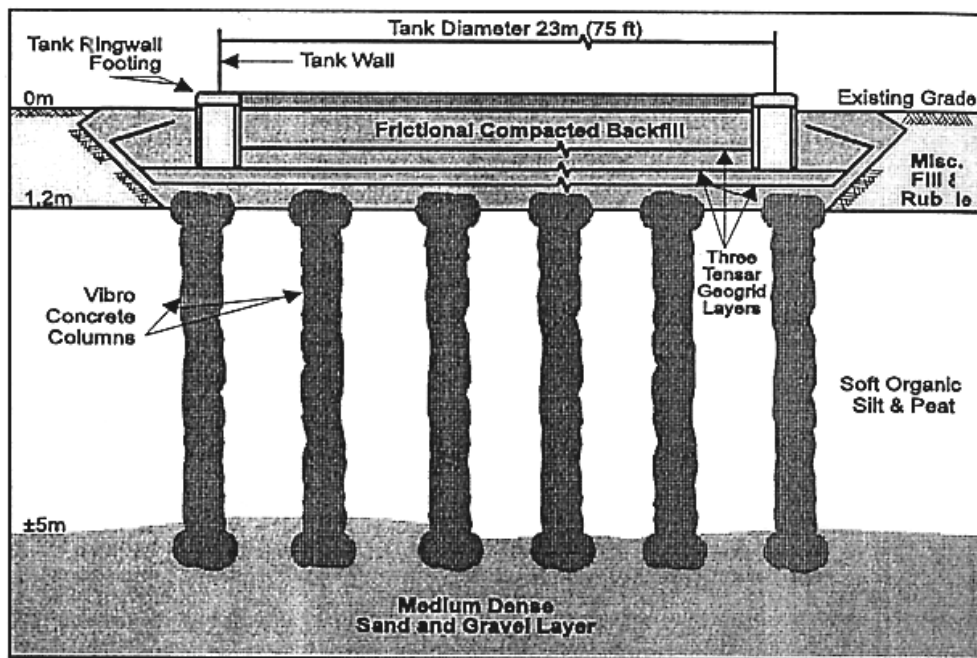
Storage Tank on A Geogrid-Reinforced and VCC-Supported Foundation (Shaefer et al., 1997)
